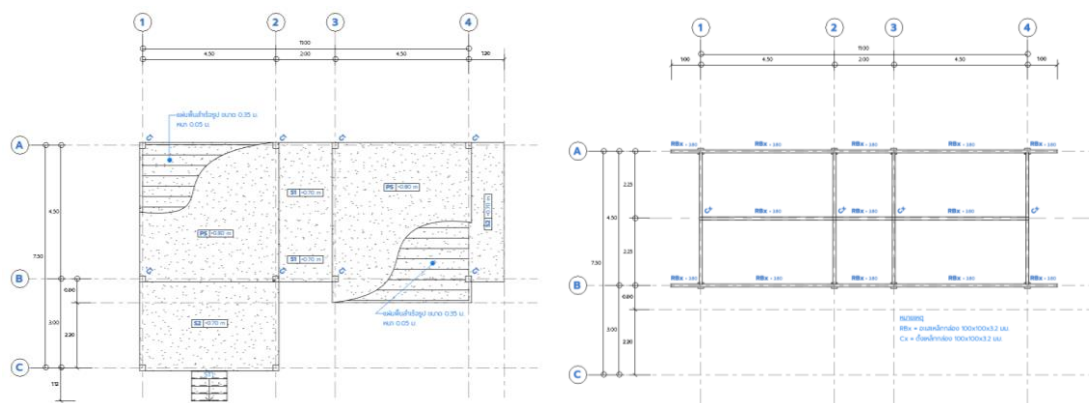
Floor Structure Plan and Roof Beam Structure Plan, 2D Construction Drawing
